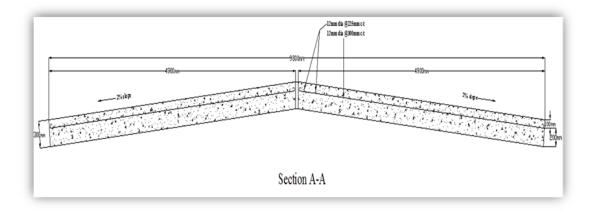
Longitudinal and Transverse Reinforcement Spacing of Rigid Pavement
